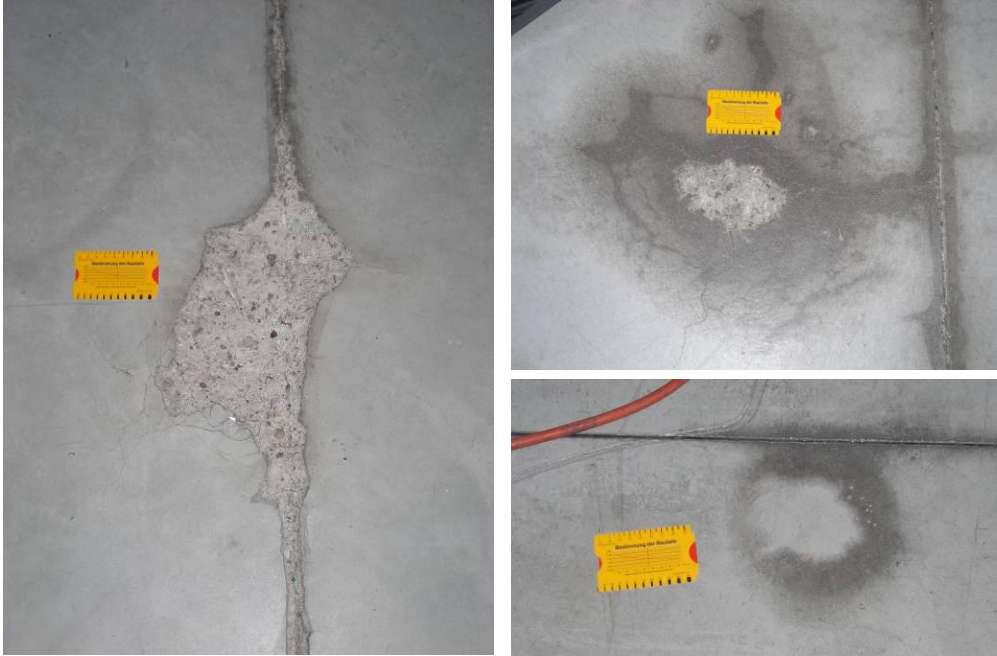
N° R.G. 6314 Swelling of the concrete
